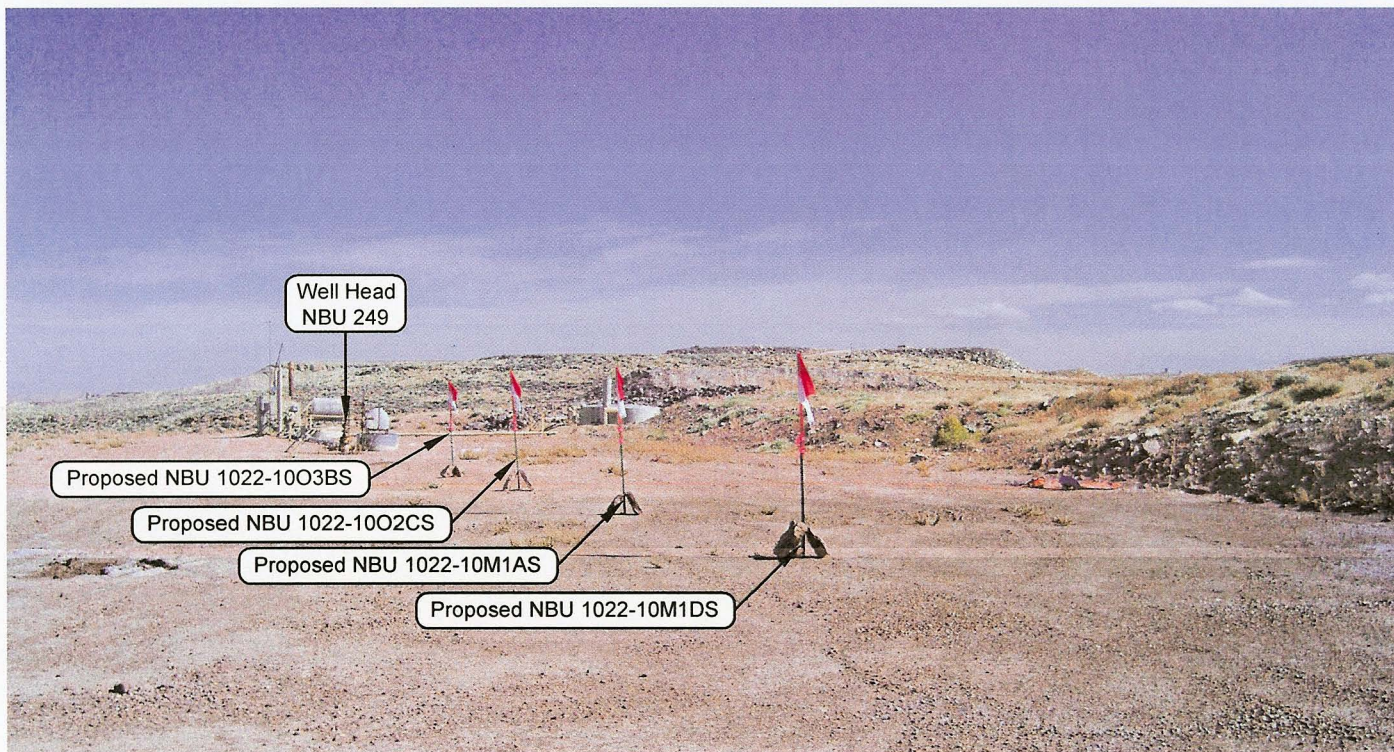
PHOTO VIEW: FROM LOCATION STAKES TO EXISTING WELL HEAD
